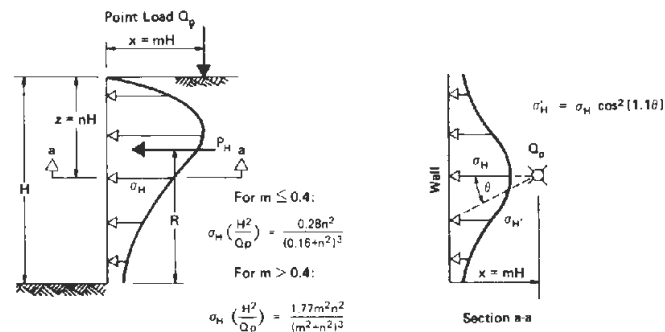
Lateral pressure due to a point surcharge load. From "Soil Mechanics, Foundations and Earth Structures" (NAVFAC DM-7, March 1971)
